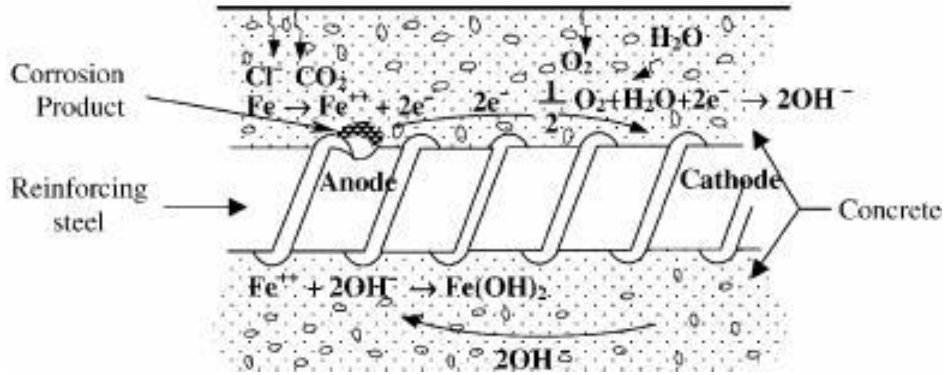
4. Schematic illustration of the corrosion of reinforcement steel in concrete [49]
